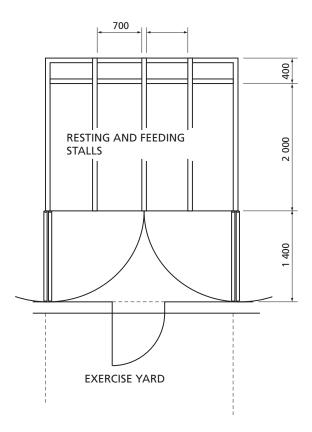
Groups of four sows in resting and feeding stalls with access to a manure alley
